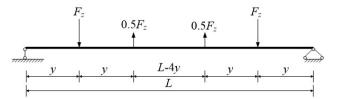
Load model 2 of trapezoidal corrugated web steel girder
